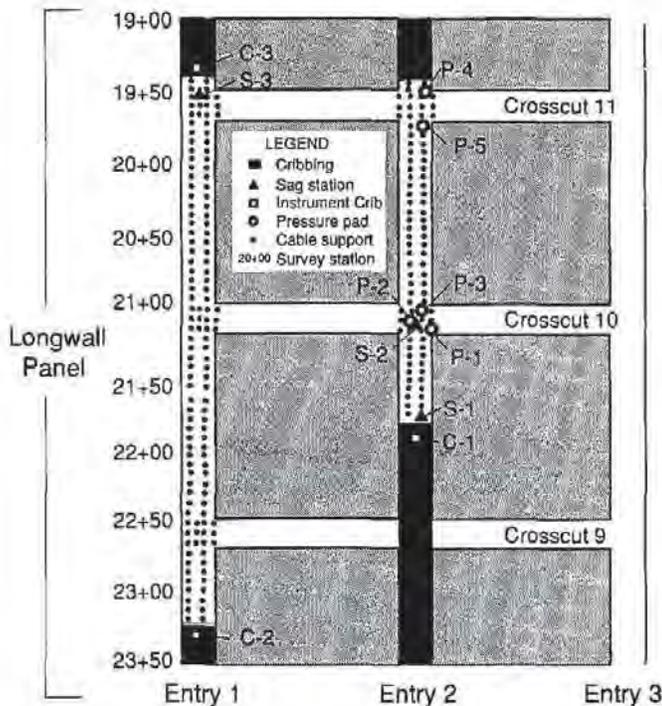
Gate roads showing the cement-grouted cable test area and instrumentation layout at a western U.S. underground longwall mine.
